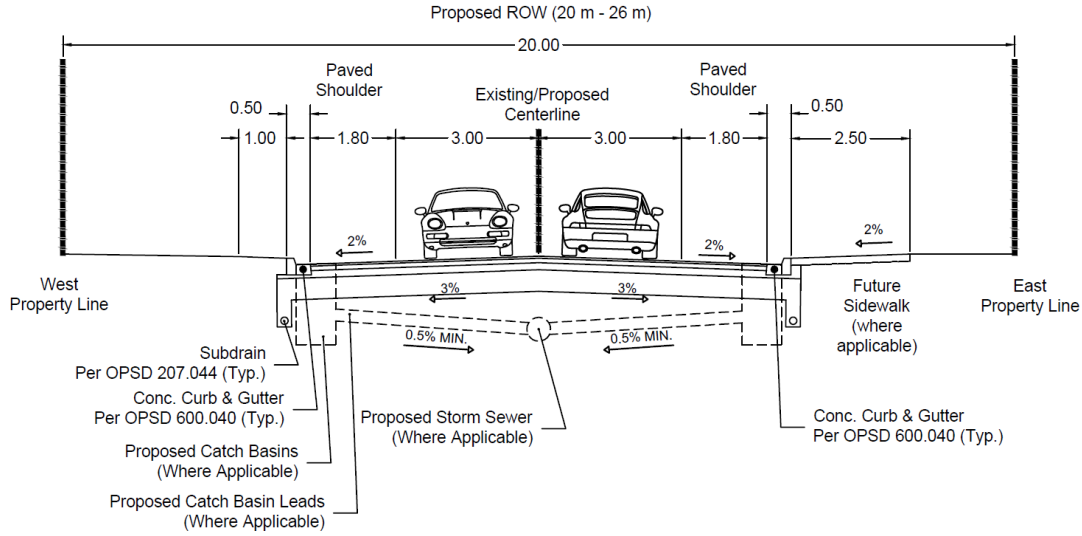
Typical Cross Section (Urban with Storm Sewer)
